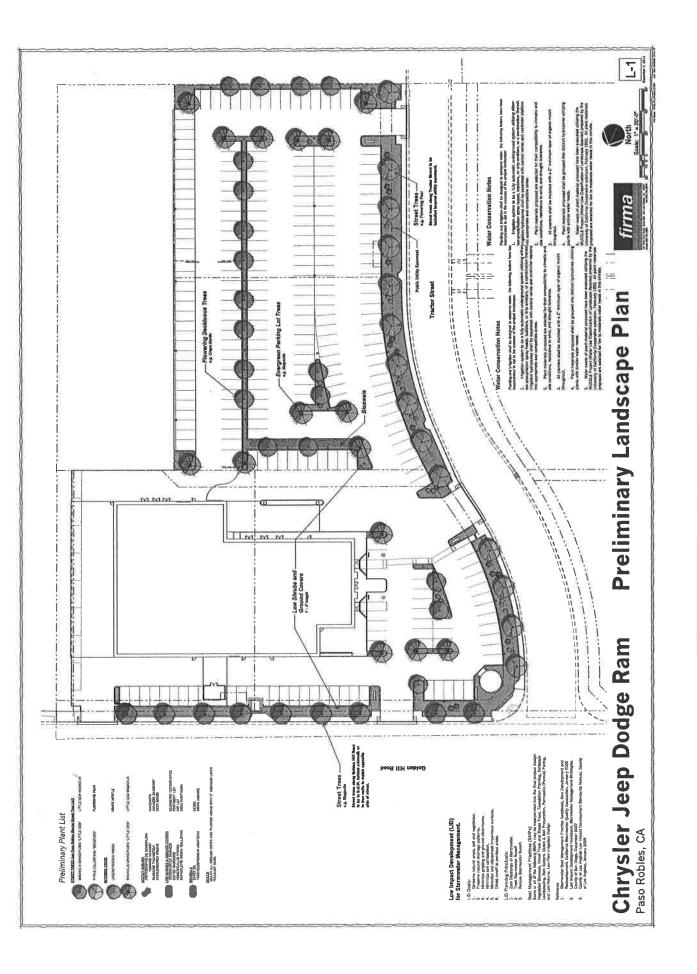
Exhibit G Preliminary Landscape Plan PD 13-006 & CUP 13-008 (Mullahey Chrysler)
